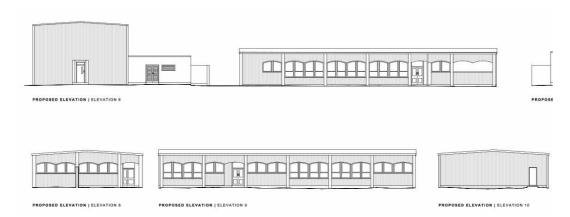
Proposed elevations of assessed building 2 - drawing 1600529.2.20 Drawn by AC by Marrons Planning
